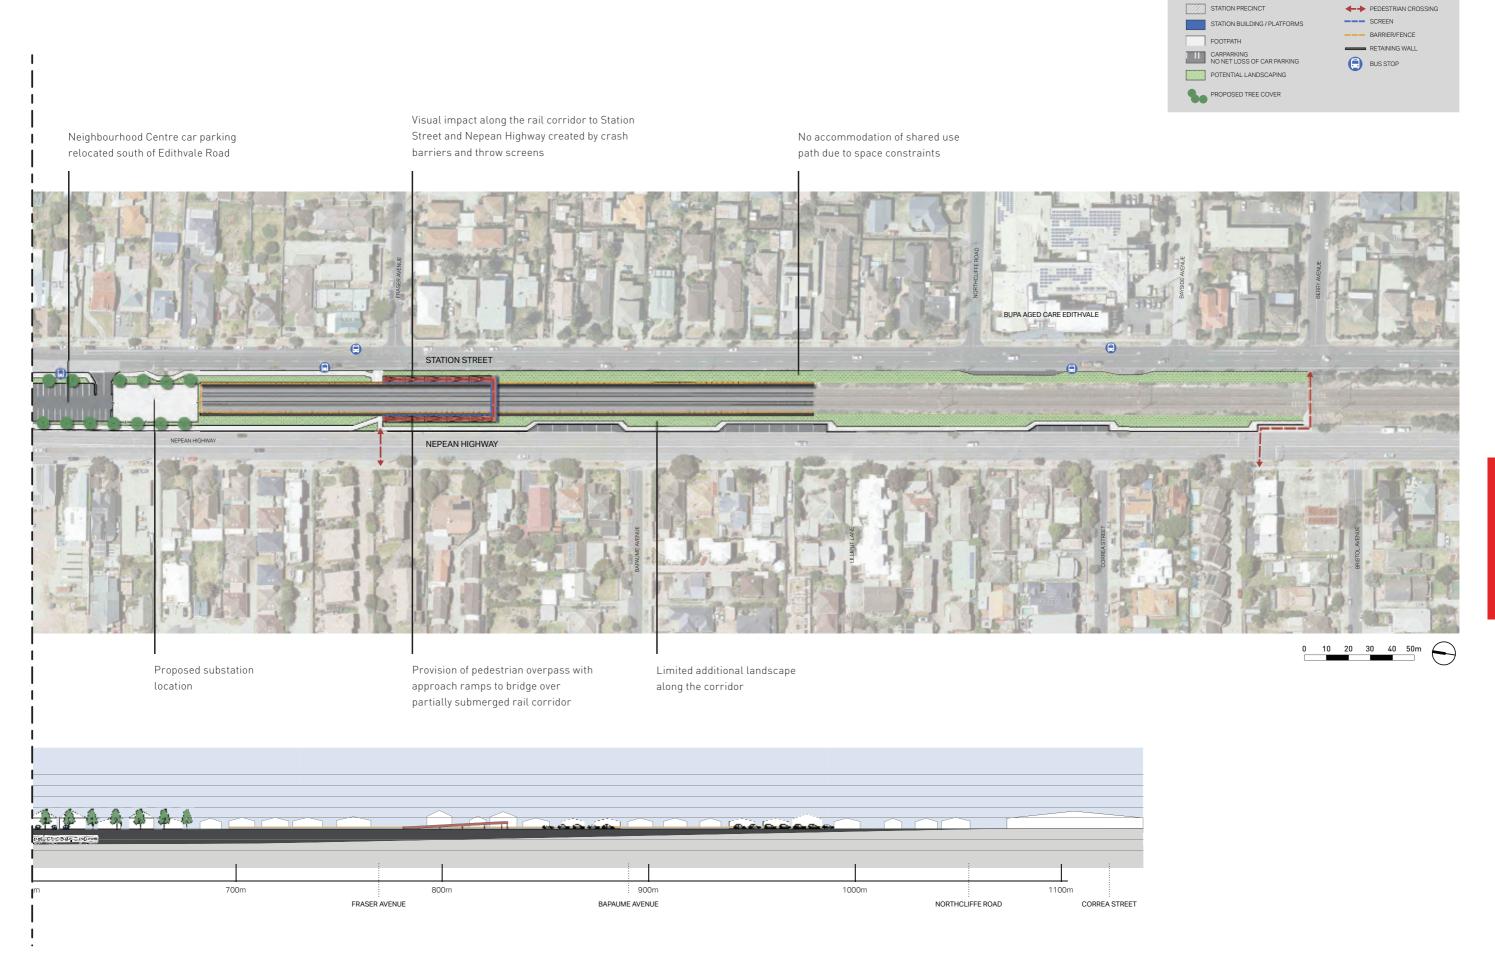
Edithvale Road - Rail Under Road Concept Elevation
